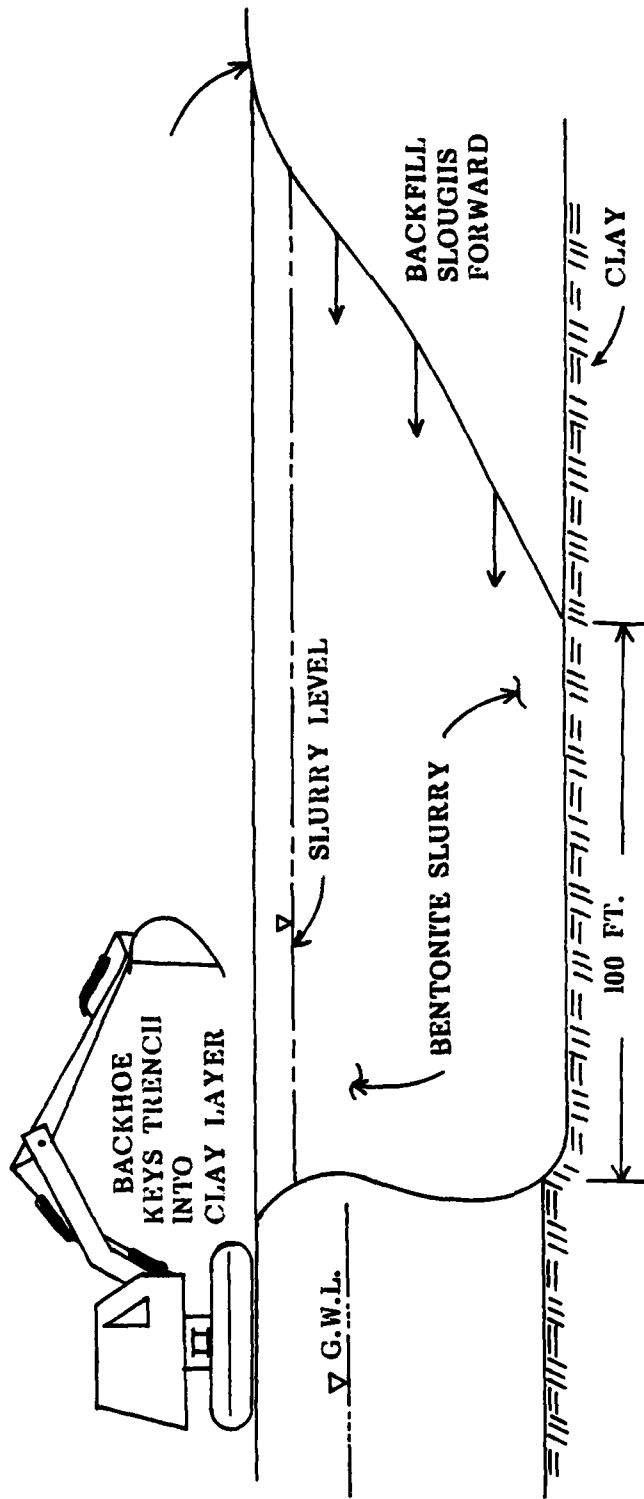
Construction of a Bentonite Slurry-Trench Cutoff Wall (Ryan, 1980)
